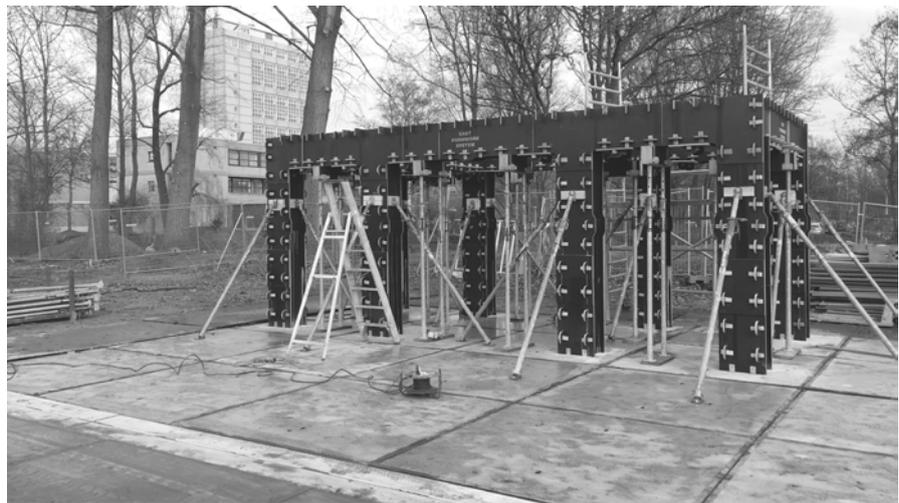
ready formwork module waiting for concrete pouring (own photo)
